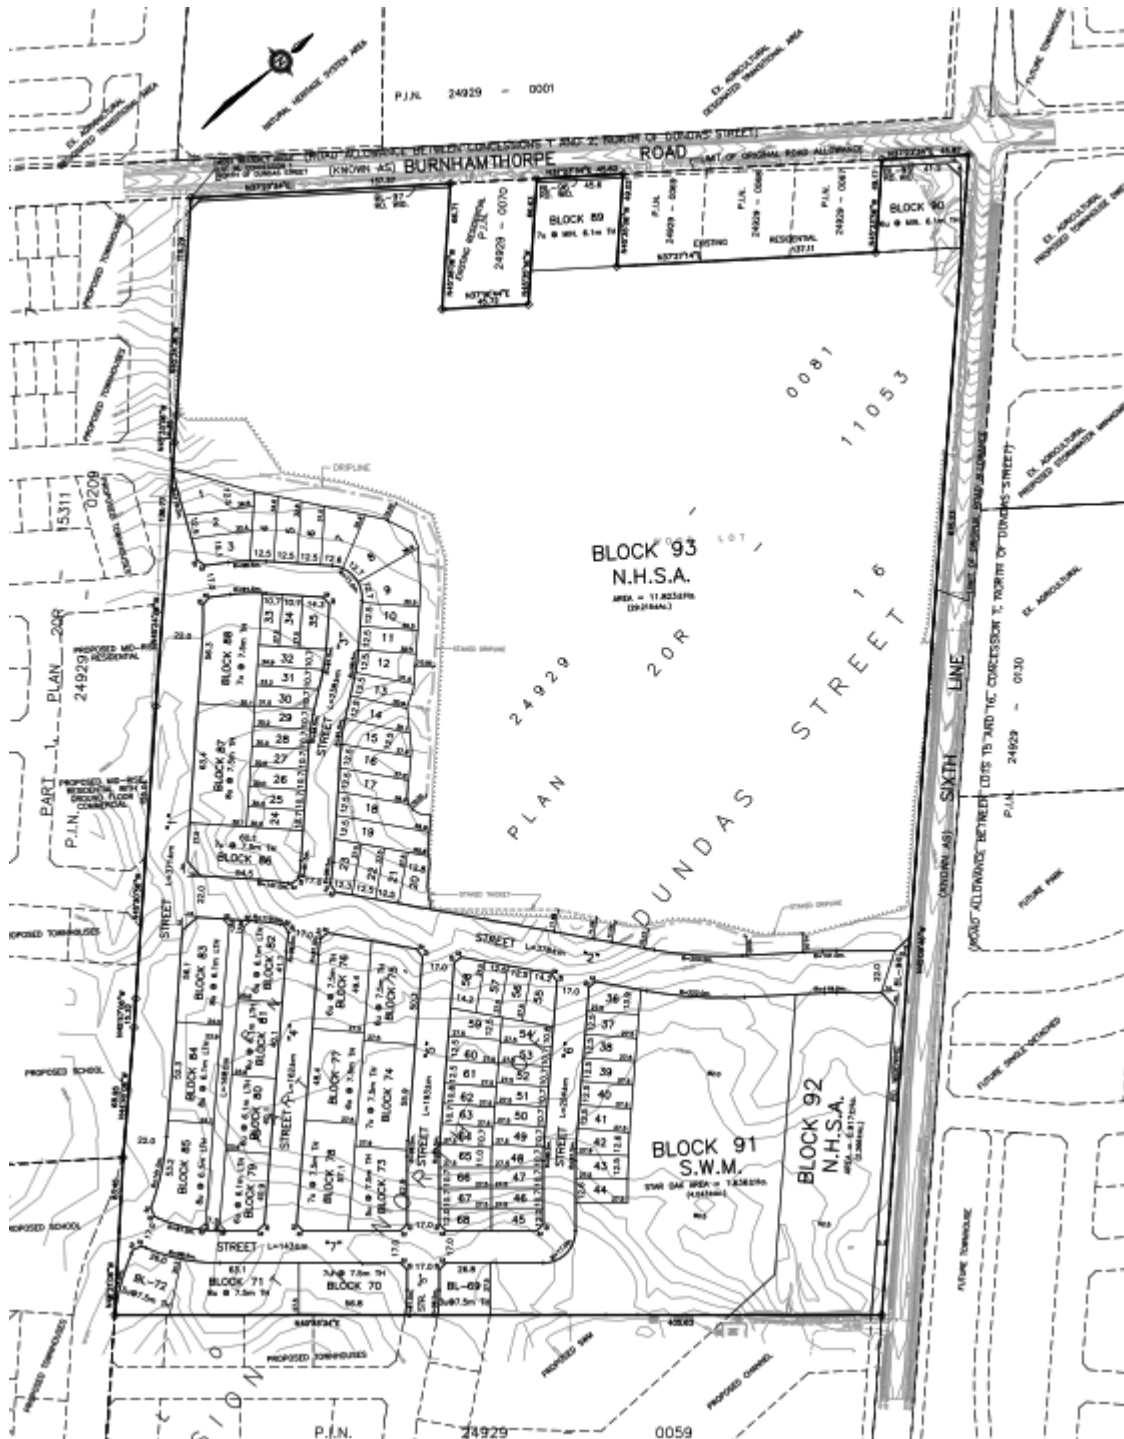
A – Proposed Draft Plan Excerpt (NTS)
